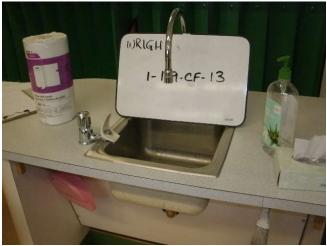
Classroom faucet w/bubbler, located on the 1st floor, in room 109.
